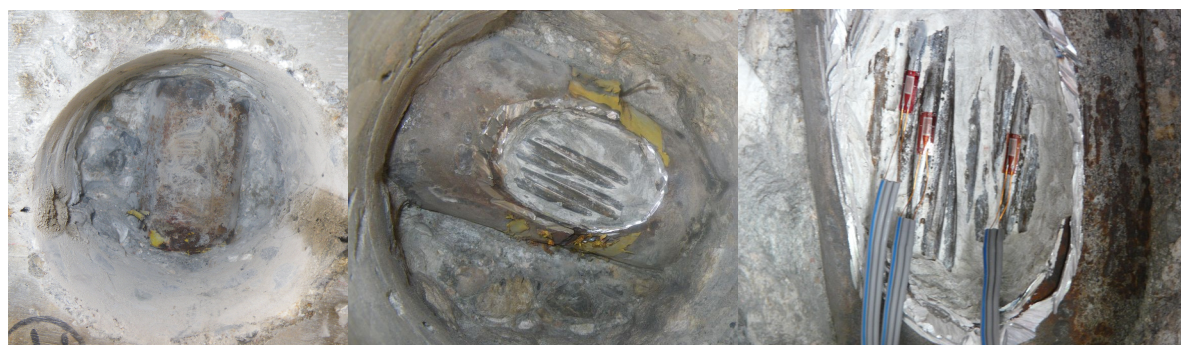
Window and protective steel duct of prestressing; Opening of the steel duct and elimination of cement grout around wires; Gluing of strain gauges on wires
